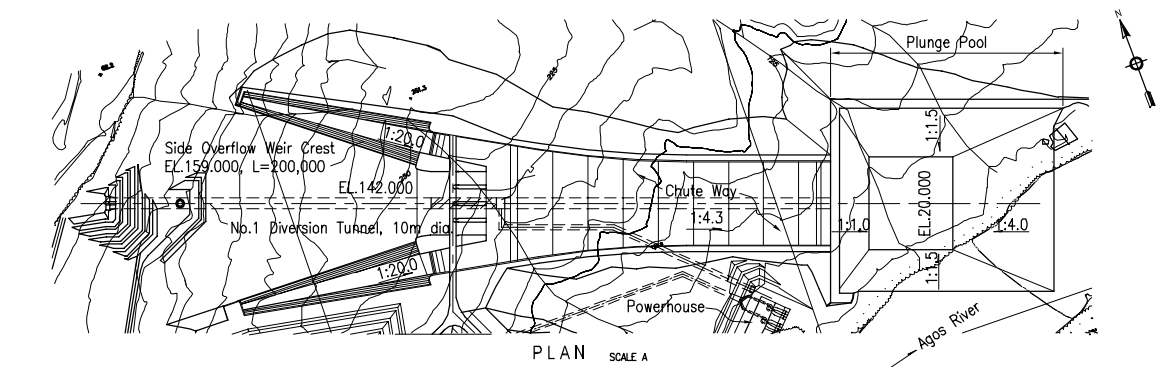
Alternative Plans Spillway Non-Gated Overflow Weir Portions Spillway
